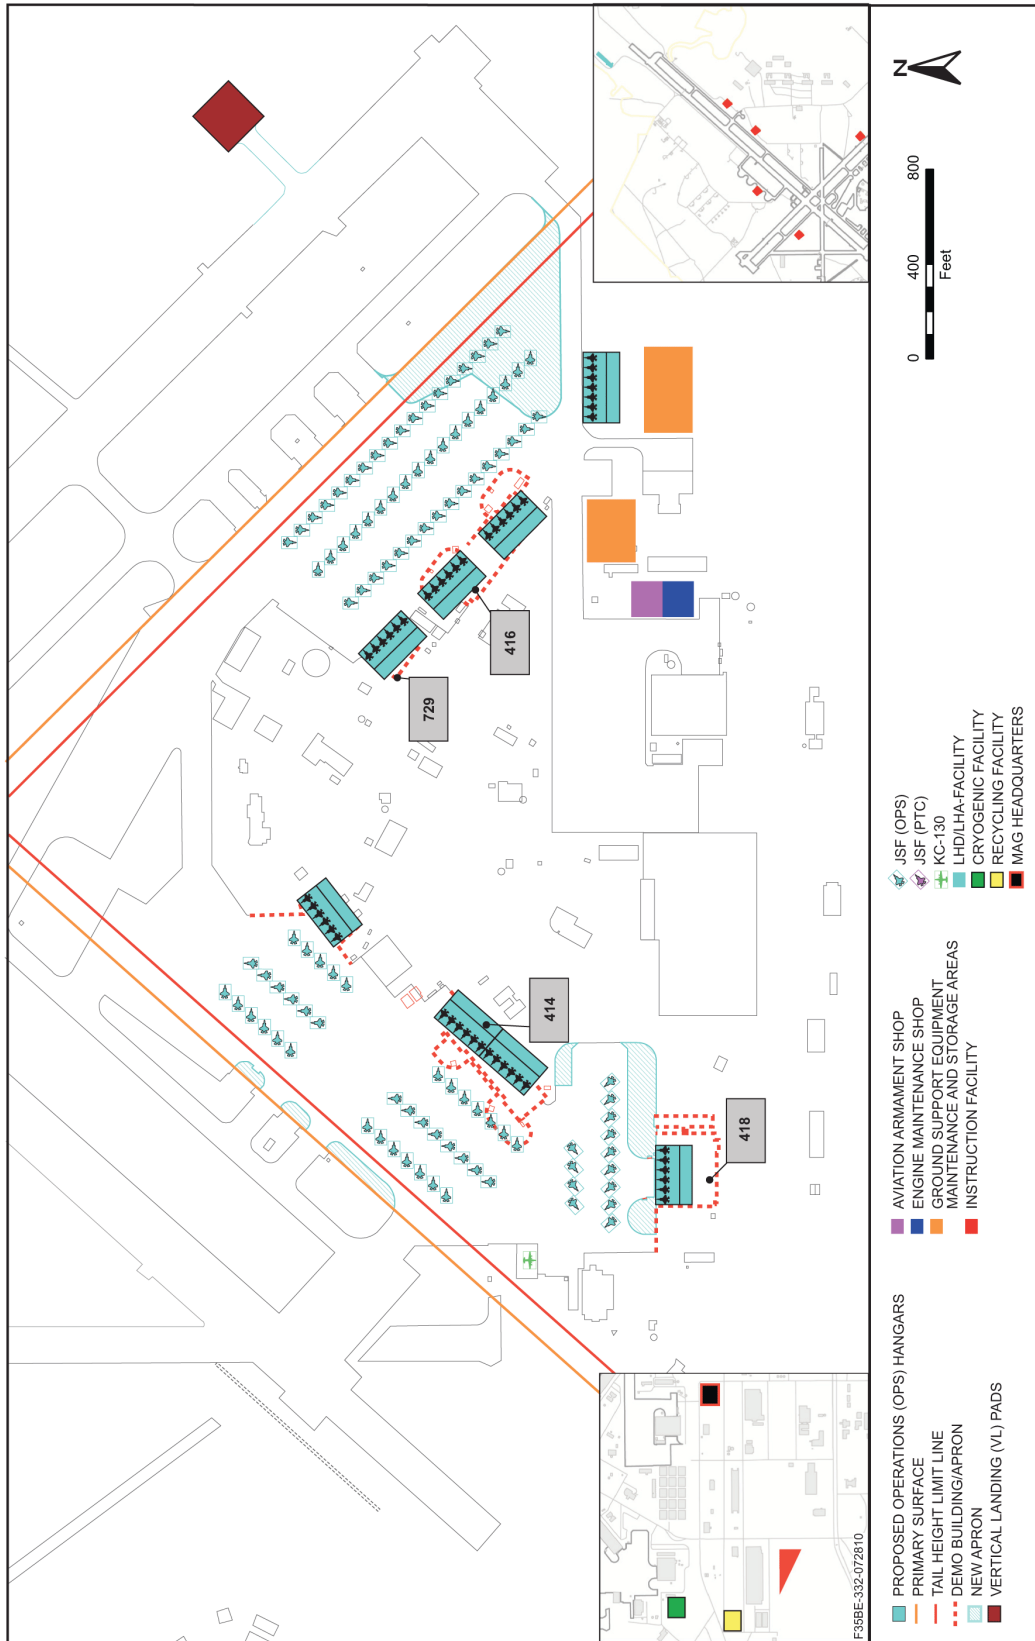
MCAS Beaufort Proposed Flightline Construction and Support Facilities under Alternative 3
